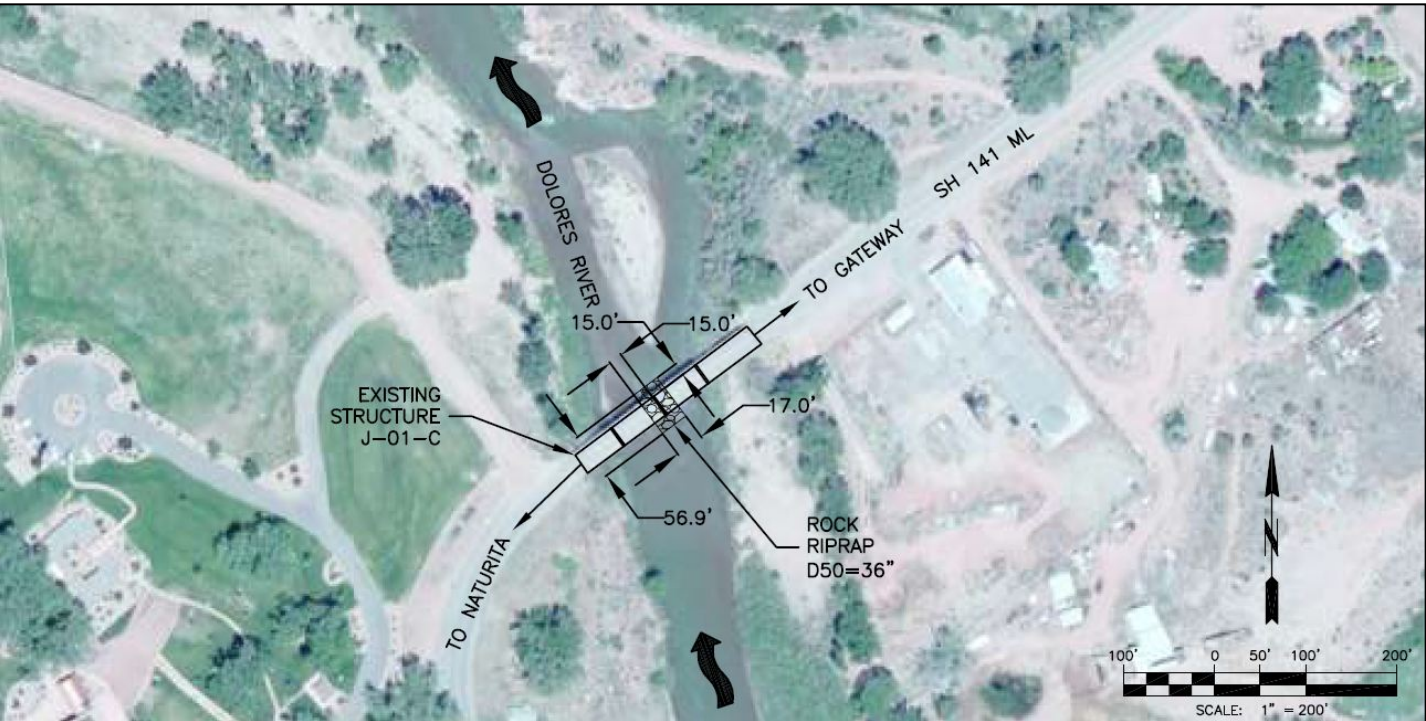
Plan view of Bridge J-01-C with recommended hydraulic scour countermeasure locations
